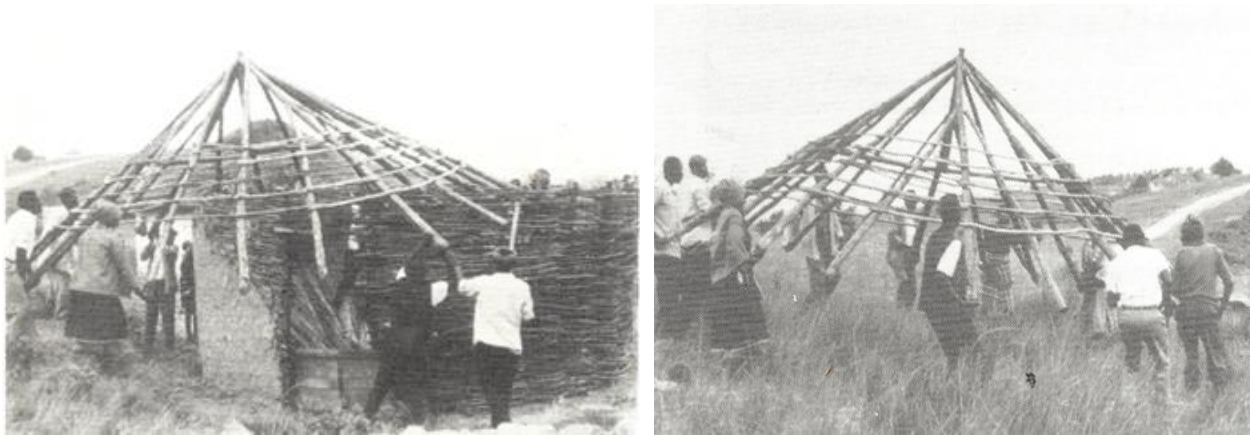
illustrate the community engagement during the construction of a Zulu hut roof structure fitting it on the timber and earth constructed walls. Source: (Frescura, 1981:135)
